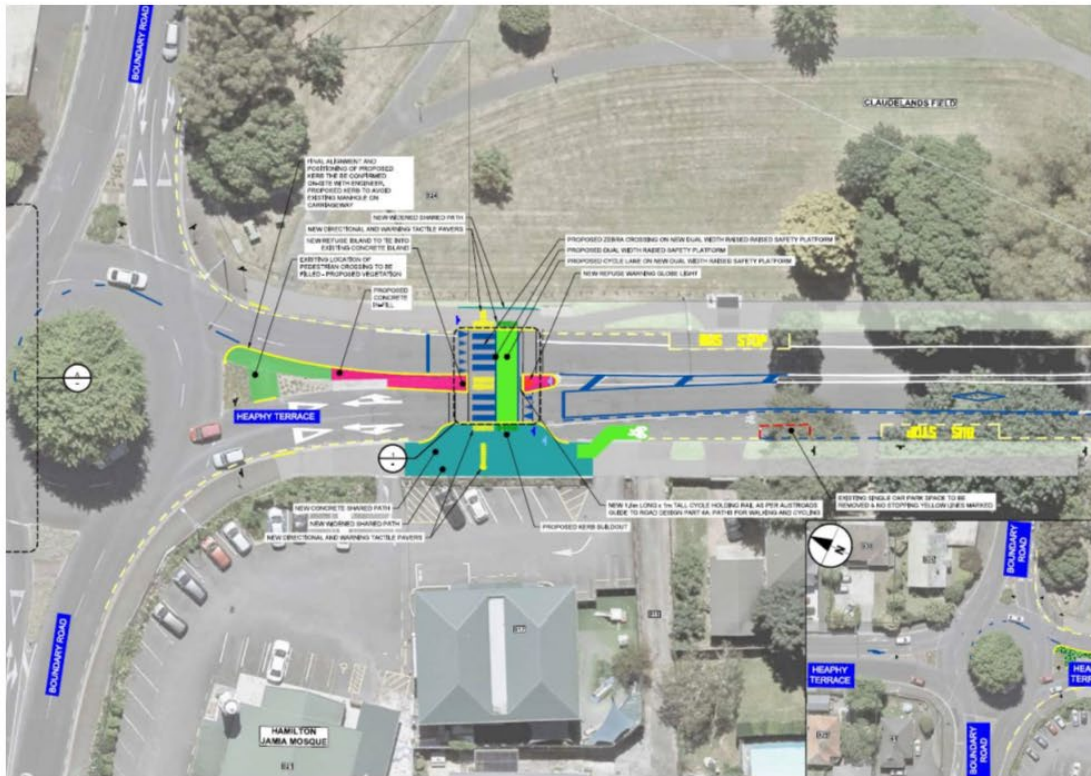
Proposed Paired Zebra Crossing on RSP and Kerb Buildout
